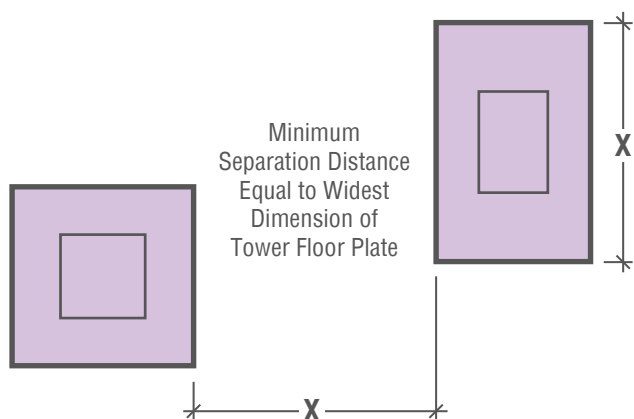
Minimum tower separation distance proportionate to floor plate size, measured from building face to building face.
